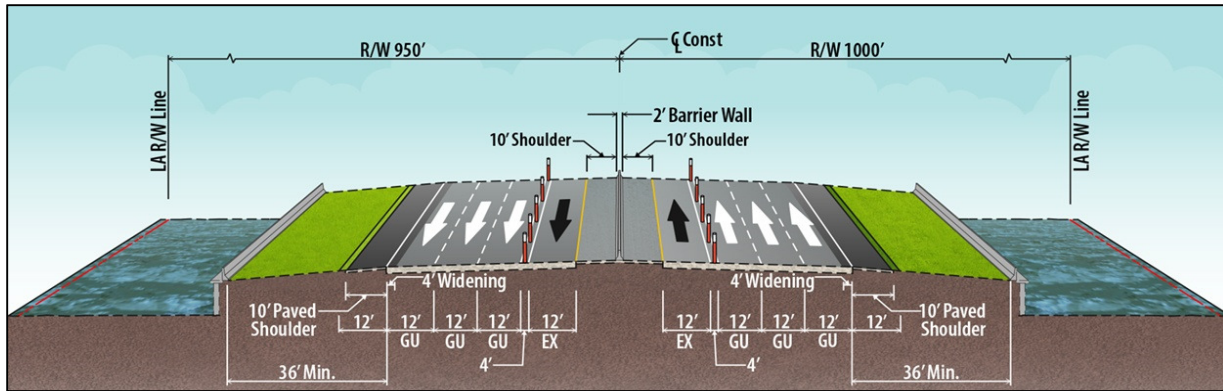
I-275 Mainline Starter Project Build Alternative Typical Section from south of 9th Street North to north of 4th Street North (Segment C-SP3)
